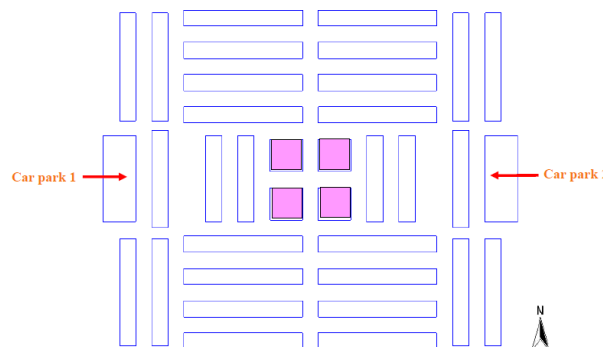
Proposed HDB precinct design layout plan with narrower spacing (canyons) between the blocks; point blocks are highlighted in pink
